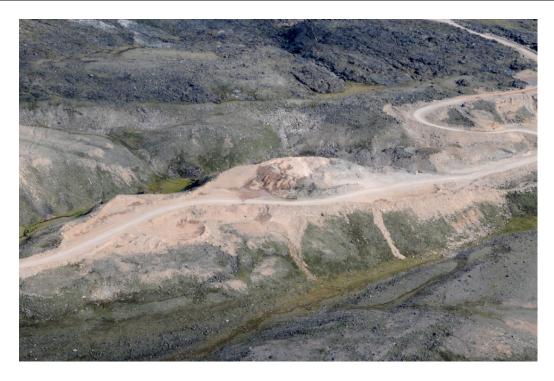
BORROW SITE KM104 EAST ALONG HAUL ROAD SHOWING GRAVELS
